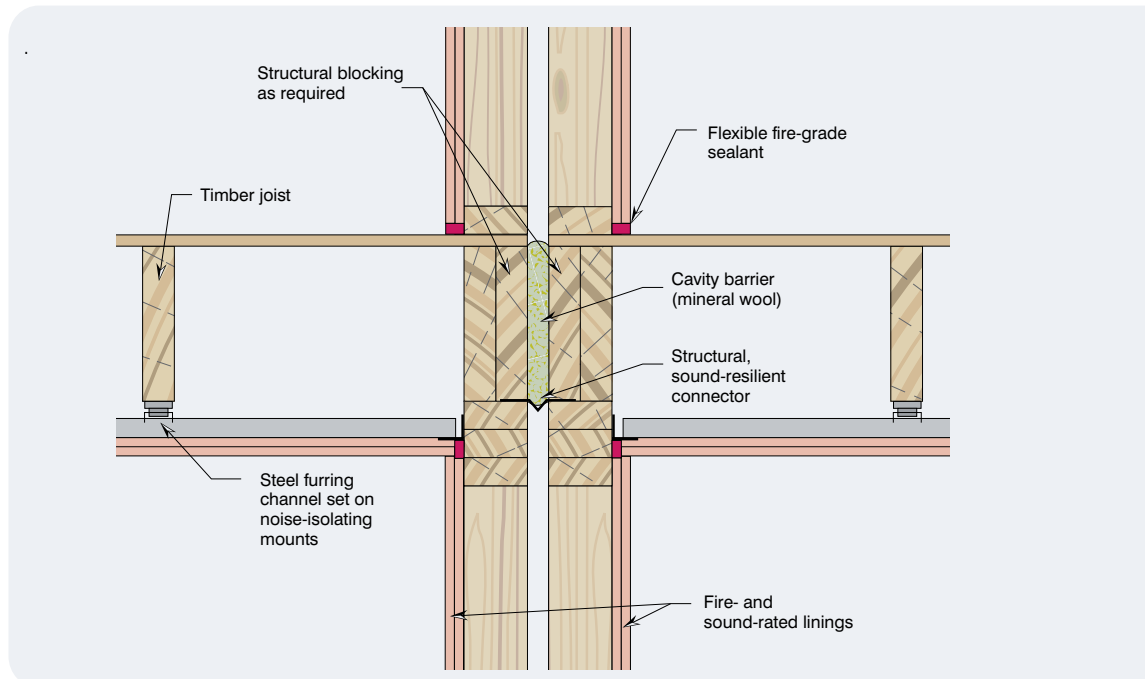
Discontinuous floor joist and floor sheeting – elevation view.
